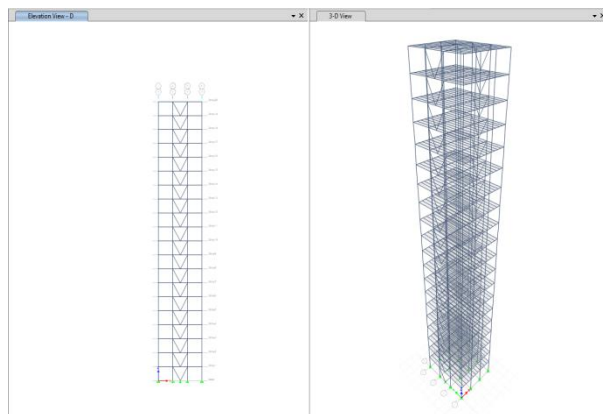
Elevation and 3D view of the building with V bracings at center bay
